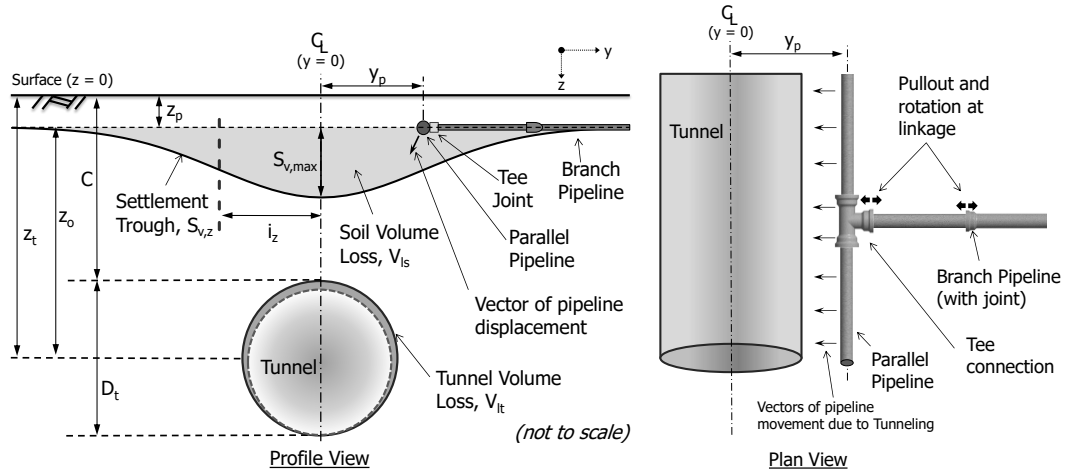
Illustration of tunnel cross-section, settlement trough and parallel pipeline with tee connection
